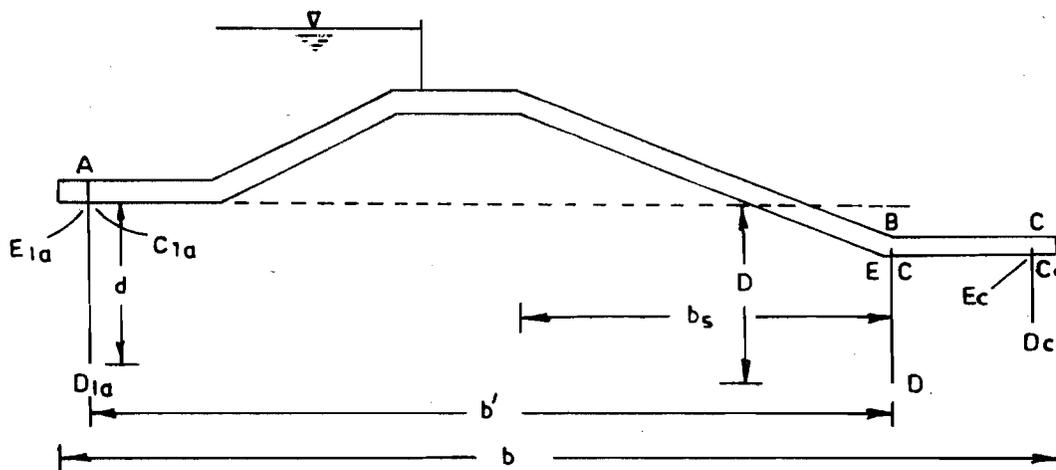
Sketch for Mutual Interference of Sheet Piles and Slope of Floor
